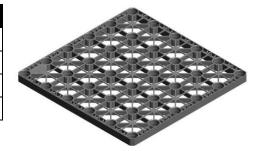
Lay the bottom large STM-01 tank plate on the flat floor / ply table.
